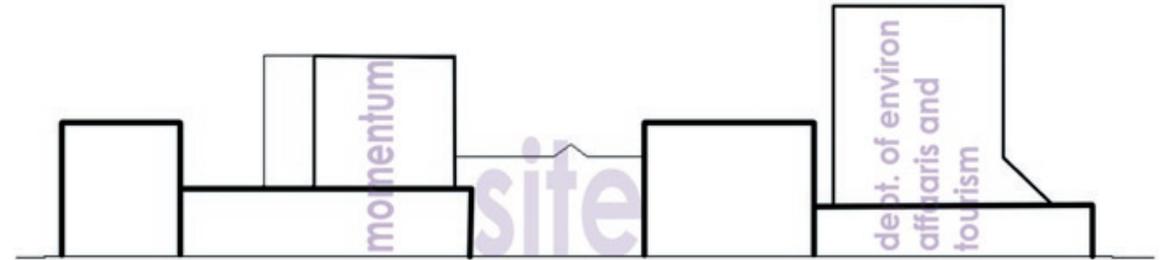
Street elevation of Pretorius Street (From Prinsloo Street to Van der Walt Street)
